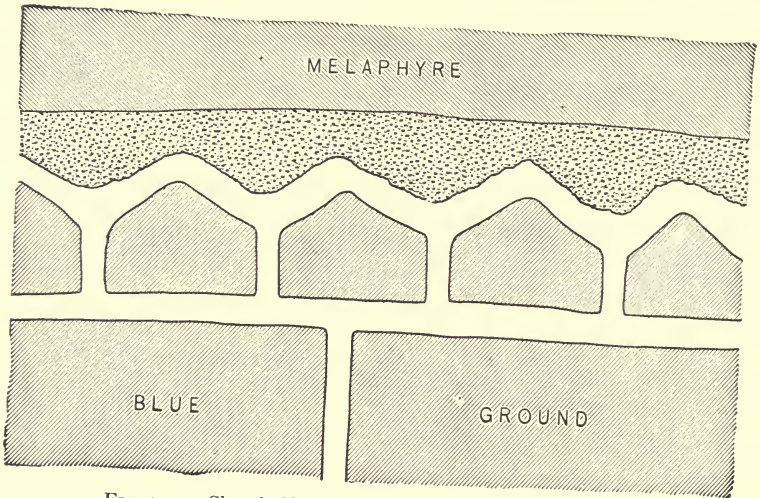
Sketch Showing Plan of Stopes Run Together.
